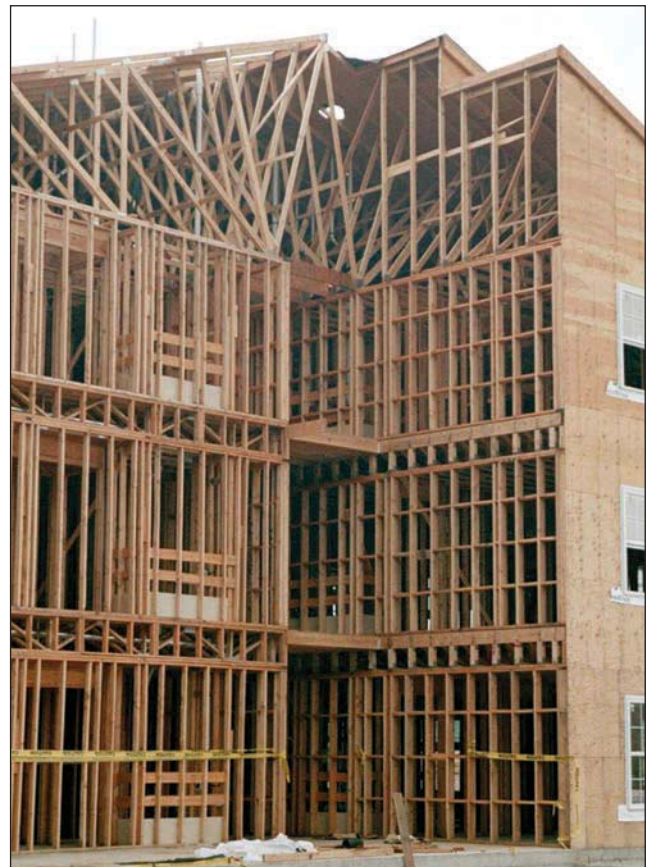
This photo details the many combustible void spaces that will be found in buildings constructed with lightweight parallel-chord floor trusses and peaked-roof trusses. Note the floor system in the center public corridor is a different floor system and may be dimensional lumber such as 2 x 8-in. (51 x 203-mm) floor joists which are attached to the ends of the floor trusses and separates the floor systems on each side of the public corridor. (Courtesy of Courtney A. Dansbach)
